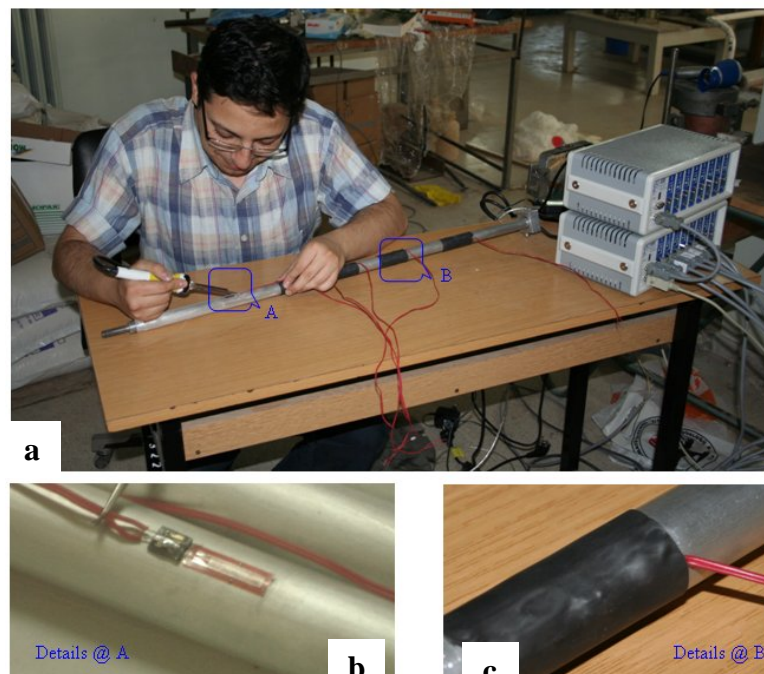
Pile instrumentation: a) Installation of gages b) Details of strain gage with connecting terminals and cable c) Precaution of gages with shrink tube
